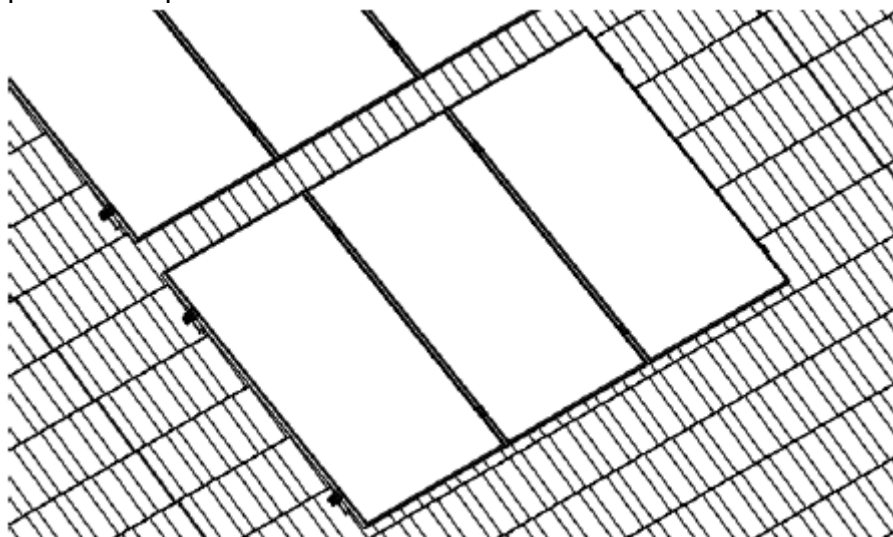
Mounting of the modules and mounting the K-05 and K-06 clamps
